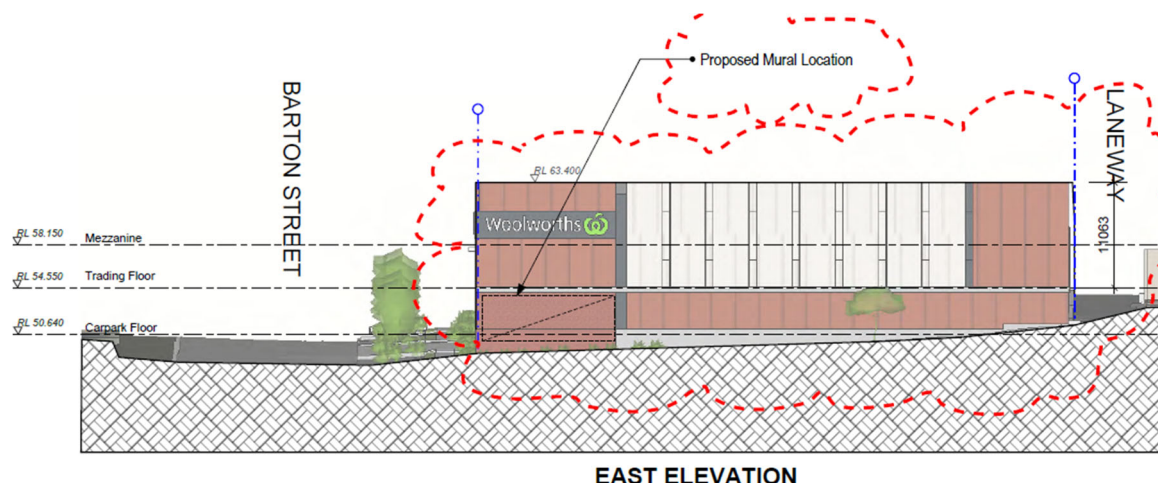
East elevation extract from Rev C 21 February 2024, with addition of new materiality as requested.
